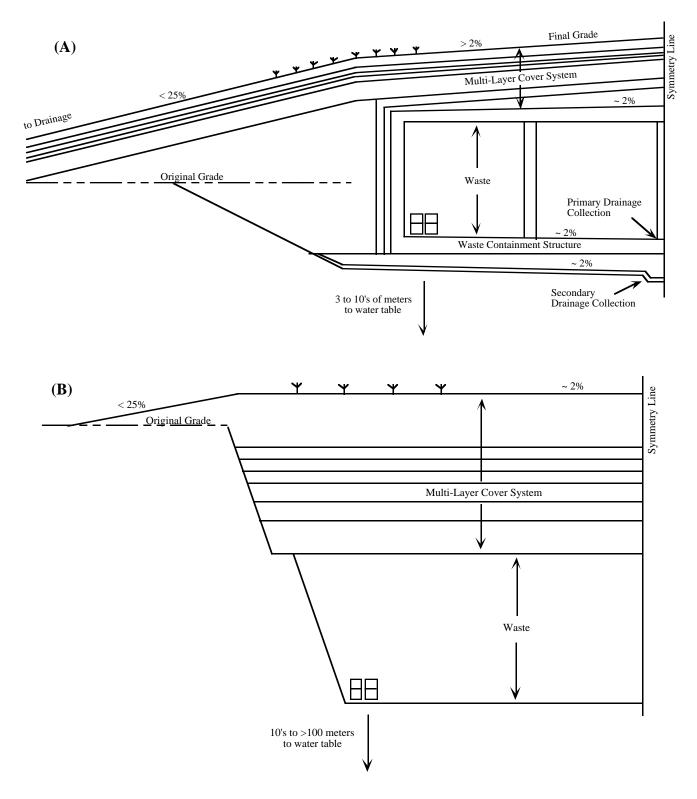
Illustrations of low-level waste disposal facility components. (A) Below ground vault typical of a humid site facility. (B) Shallow land burial typical of an arid site facility.
